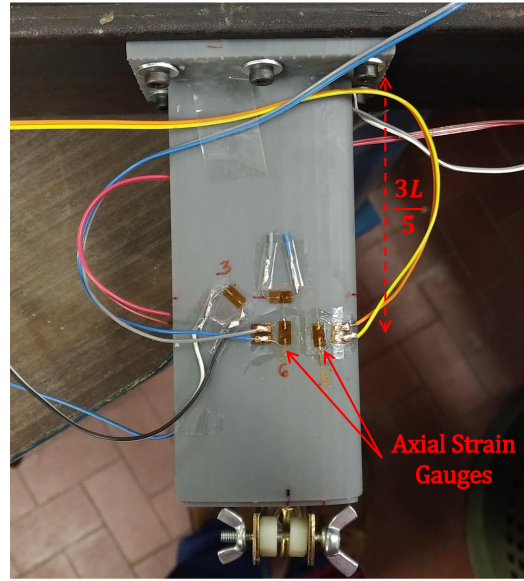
Top view of the beam specimen showing the location of the axial strain gauges
